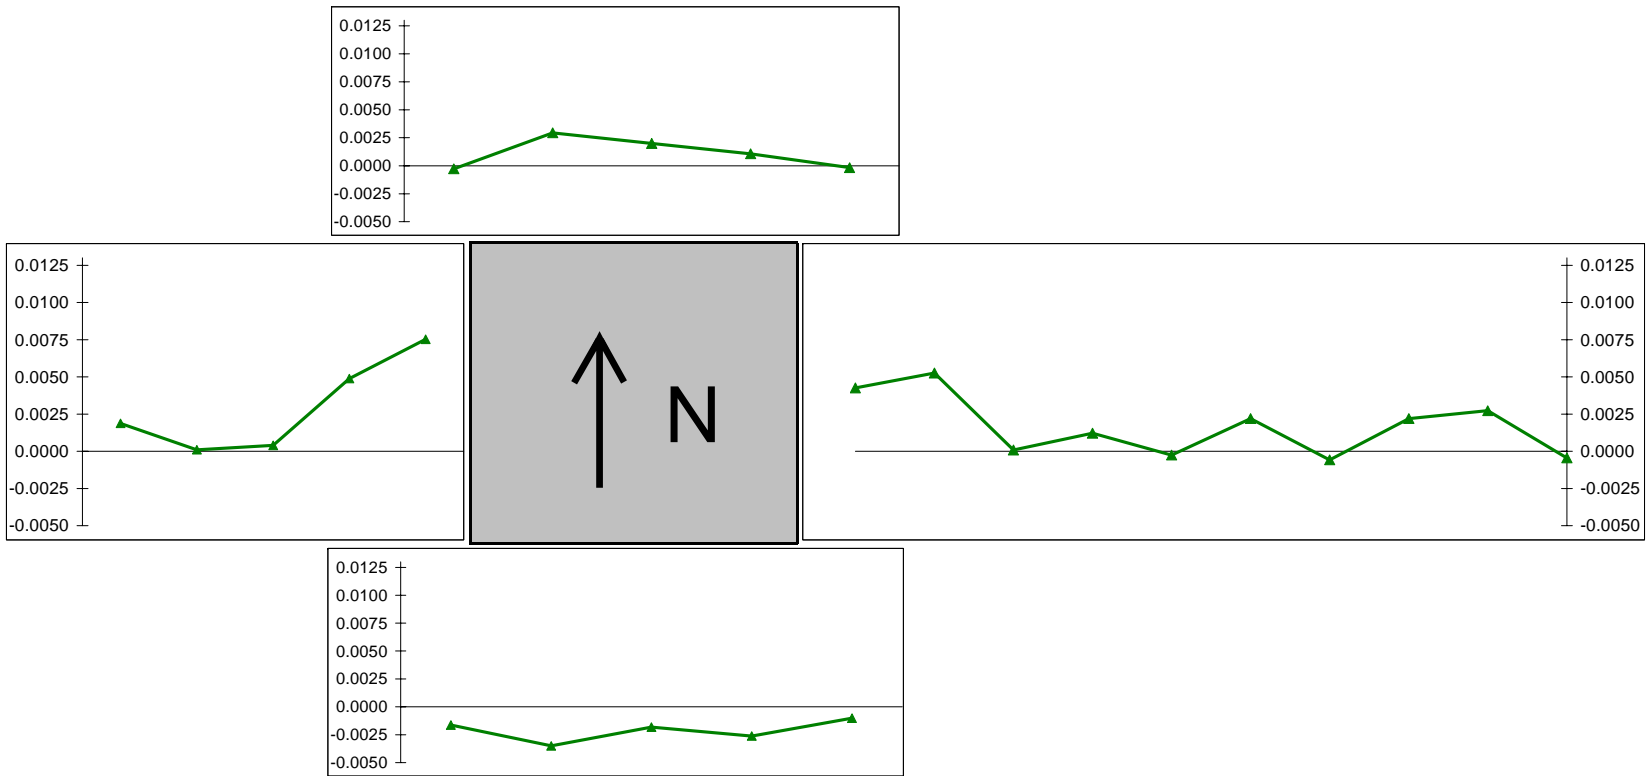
Column 3-2A Strains in Slab Surface (South 3% Roof Drift Ratio)
